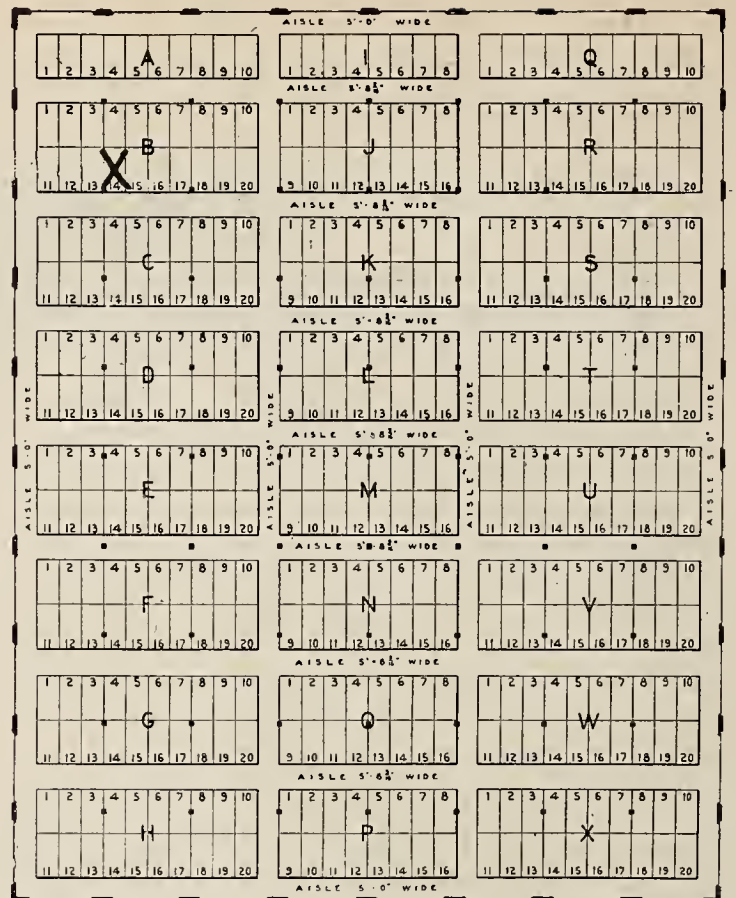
FLOOR PLAN MAIN EXHIBIT BUILDING, AMERICAN RAILWAY APPLIANCE EXPOSITION, WASHINGTON, D. C. SECTION B, STALL NO. 14, INDICATED BY CROSS, WILL BE THE HEADQUARTERS OF THE RAILWAY MASTER MECHANIC.
